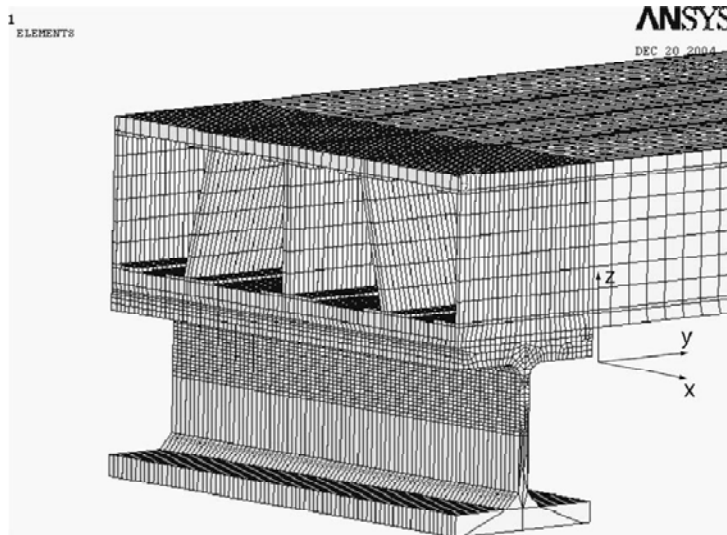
Finite element modelling of deck adhesively connected to steel girder (Keller & Schollmayer, 2009)
